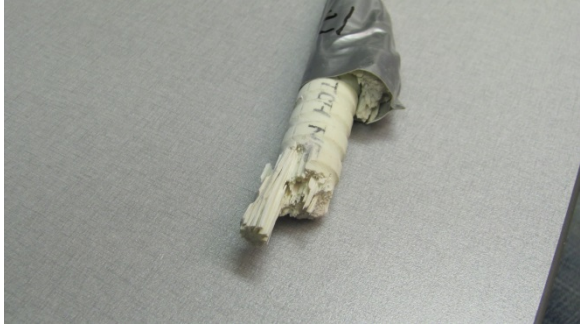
RB-3: Bottom Bar #12 fracture plane.
